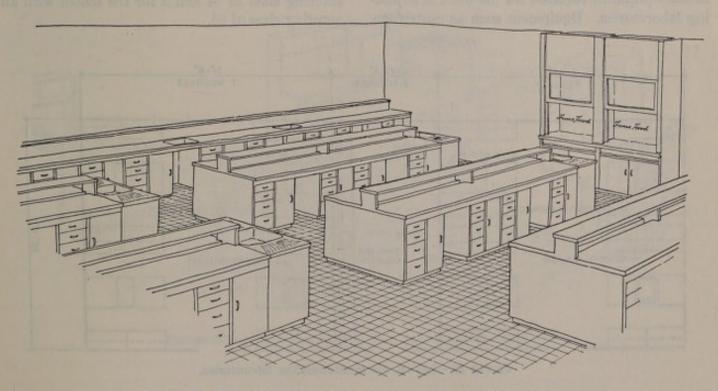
Perspective drawing of a conventional teaching laboratory.
